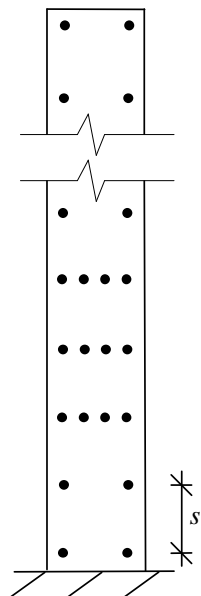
Cross-section of the combined reinforcement case, cross-section 3.
